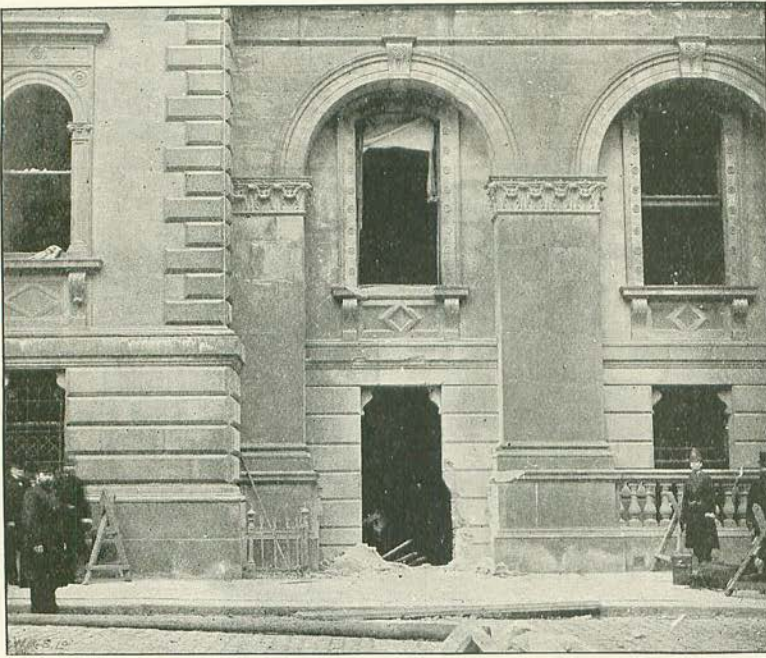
EXPLOSION AT LOCAL GOVERNMENT BOARD OFFICE.
